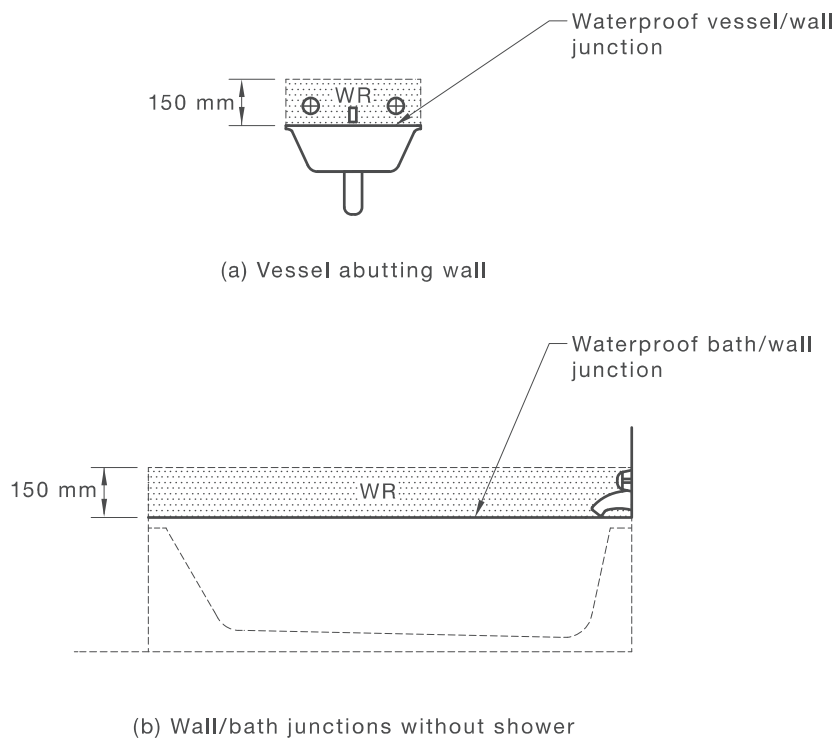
BATH AND VESSEL ABUTTING WALL—AREAS TO BE PROTECTED
